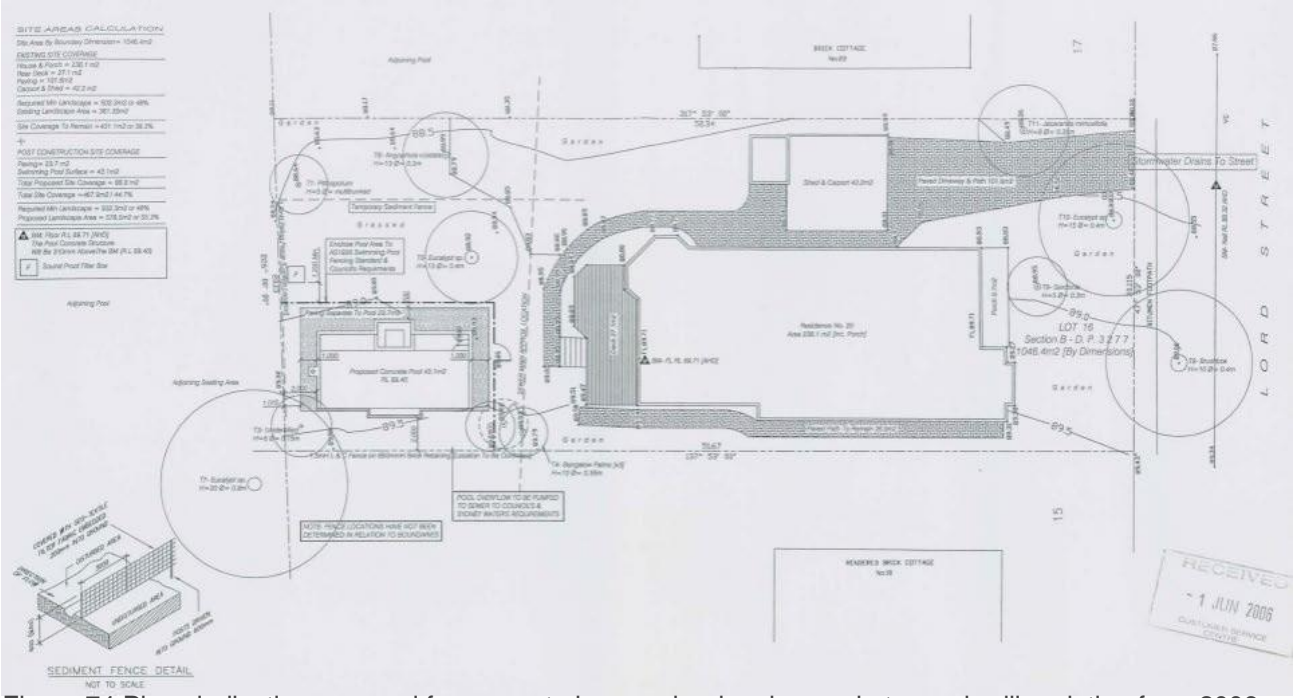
Plans indicating proposal for concrete inground swimming pool at rear dwelling dating from 2006
